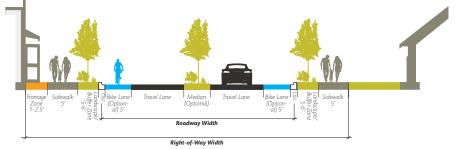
Major Local Street Cross Section with Bike Lanes
